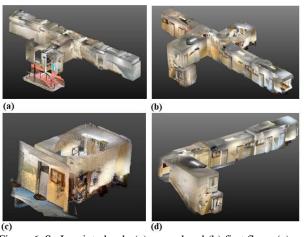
SwL point cloud, (a) ground and (b) first floor, (c) entrance to the building, (d) second floor.
